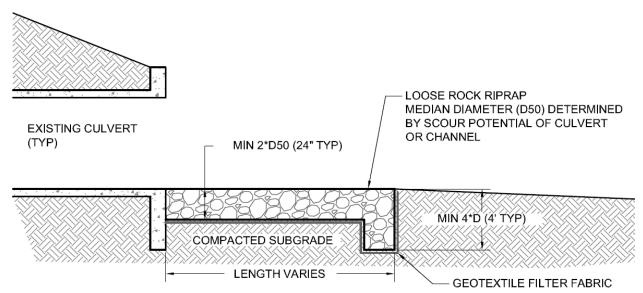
Typical Loose Riprap Installation at a Culvert Outfall.
